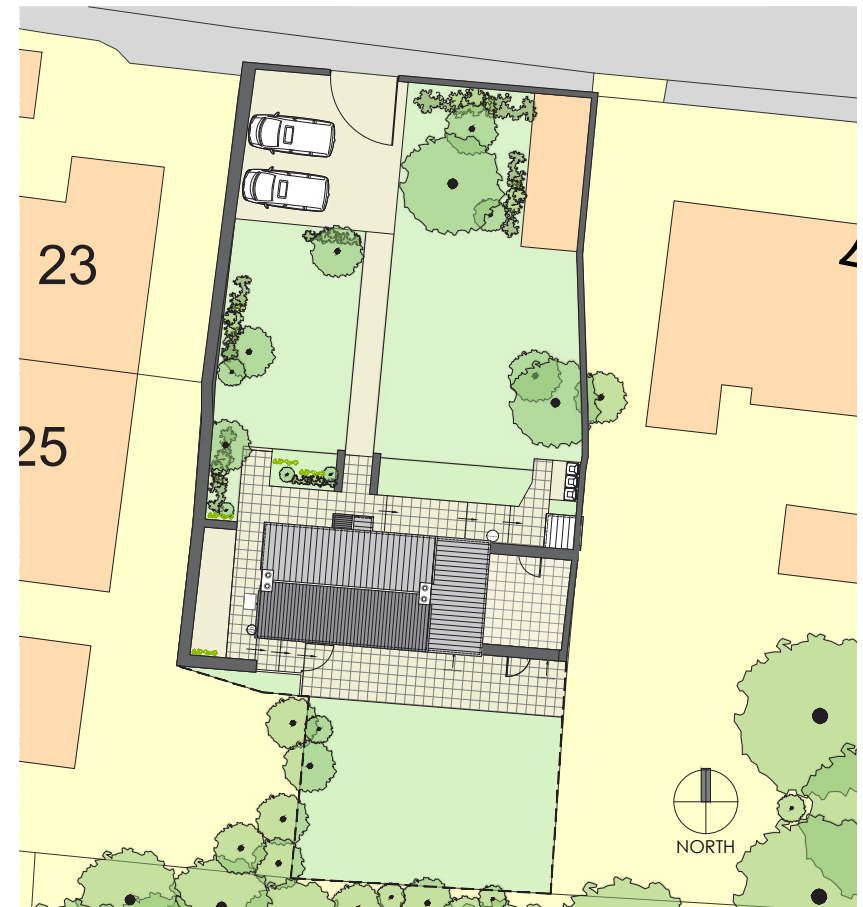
C. Existing Site Plan Showing 20+ Meter Set Back
